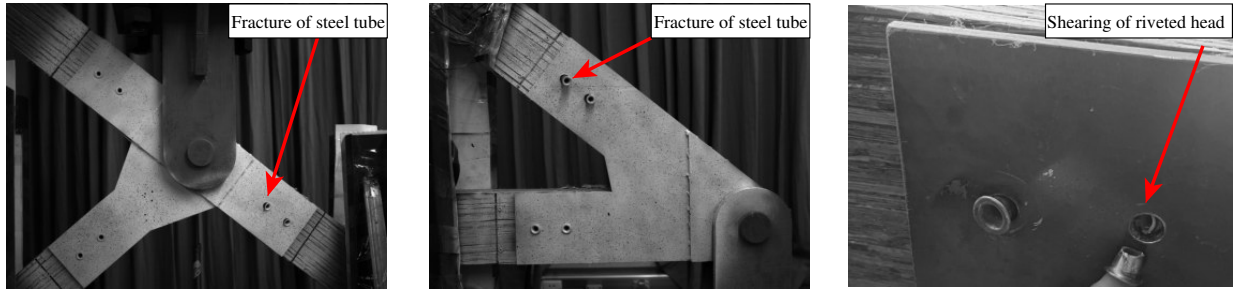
Typical failure pattern of planar roof trusses.
